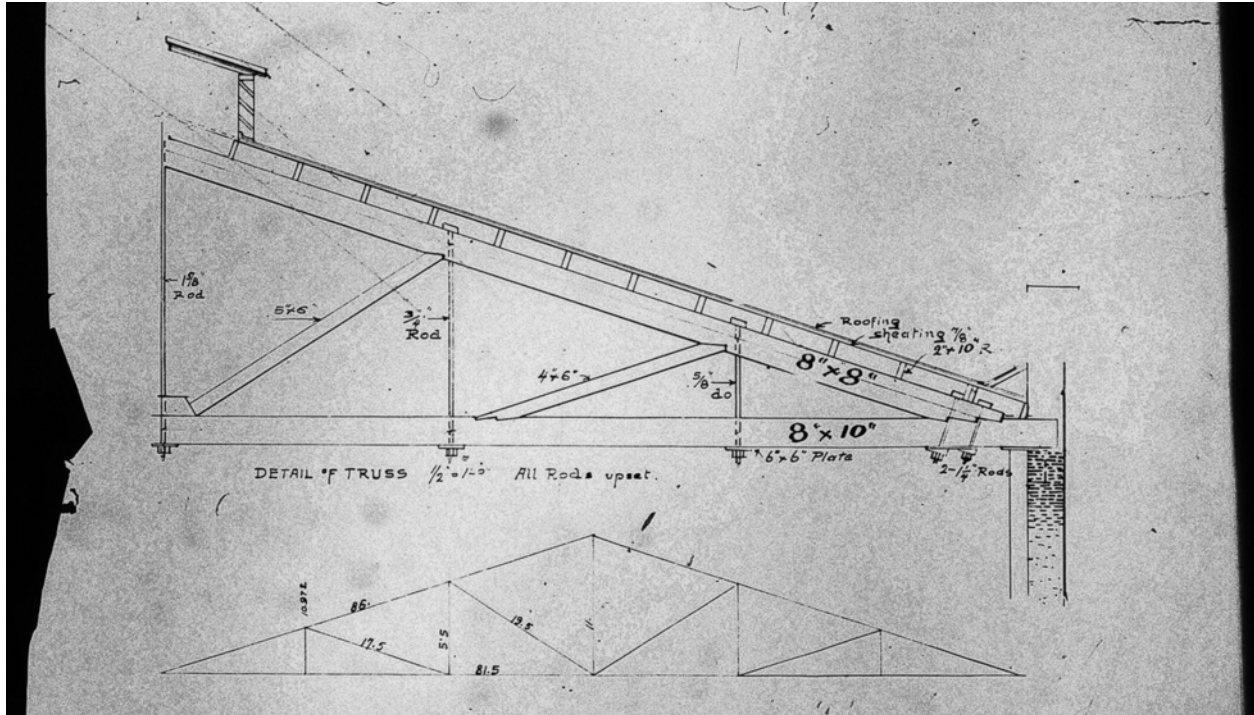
1001 S. King Street - Truss Details (no date)
